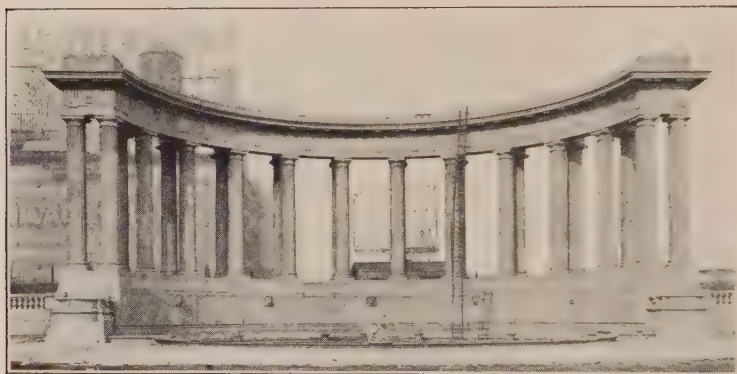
FRONT VIEW OF COLONNADE, FOUNTAIN AND POOL.
